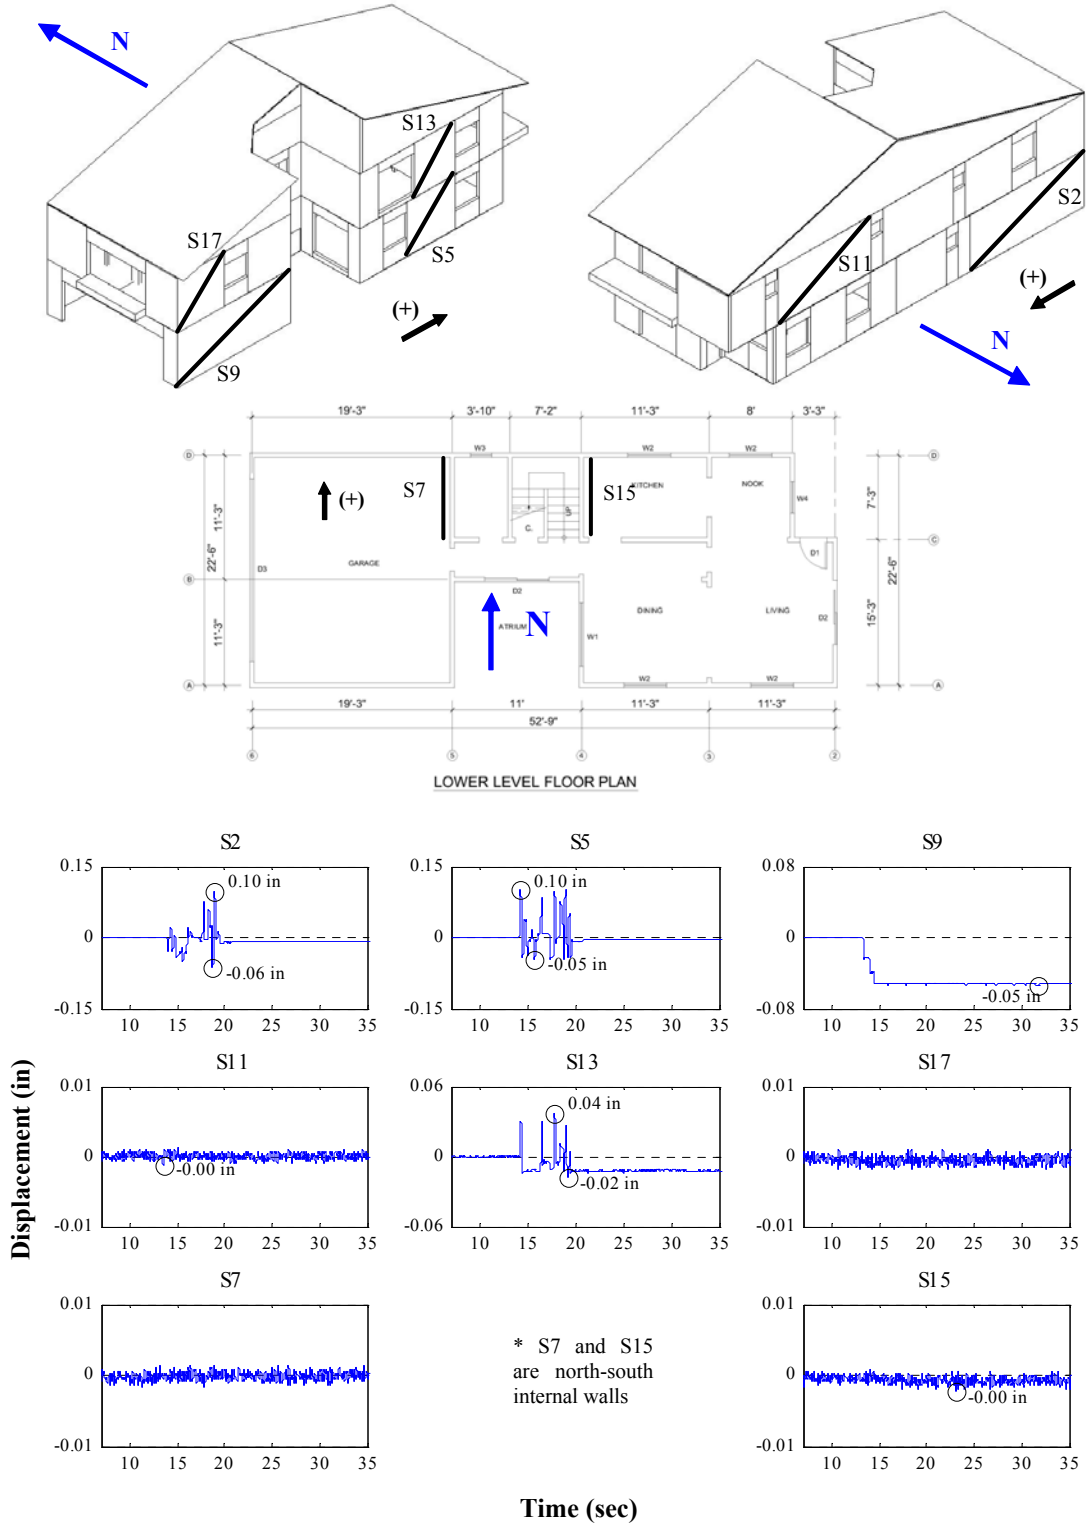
Wall deformations of east-west internal walls for Test NWP2S21
